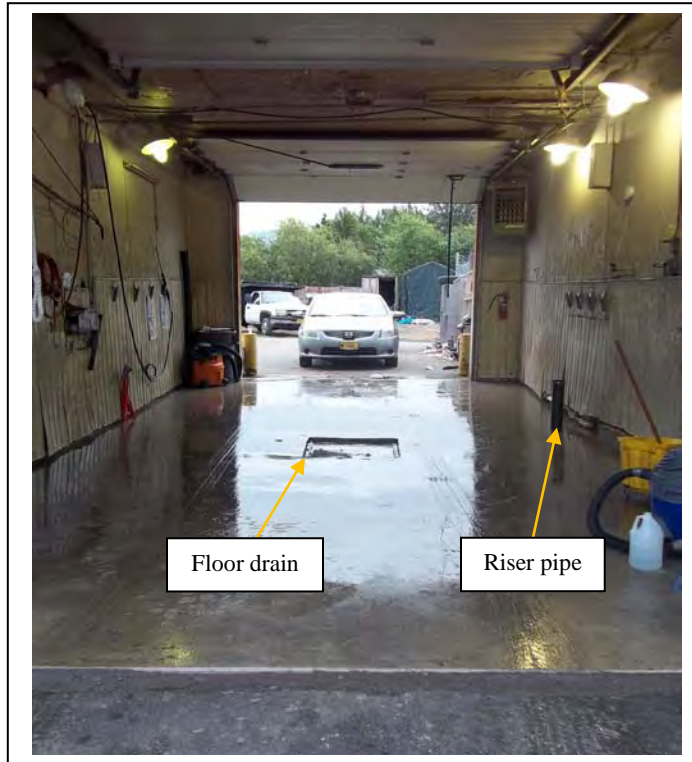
The southern bays of the car wash structure contain floor drains; looking east. (August 17, 2012)
